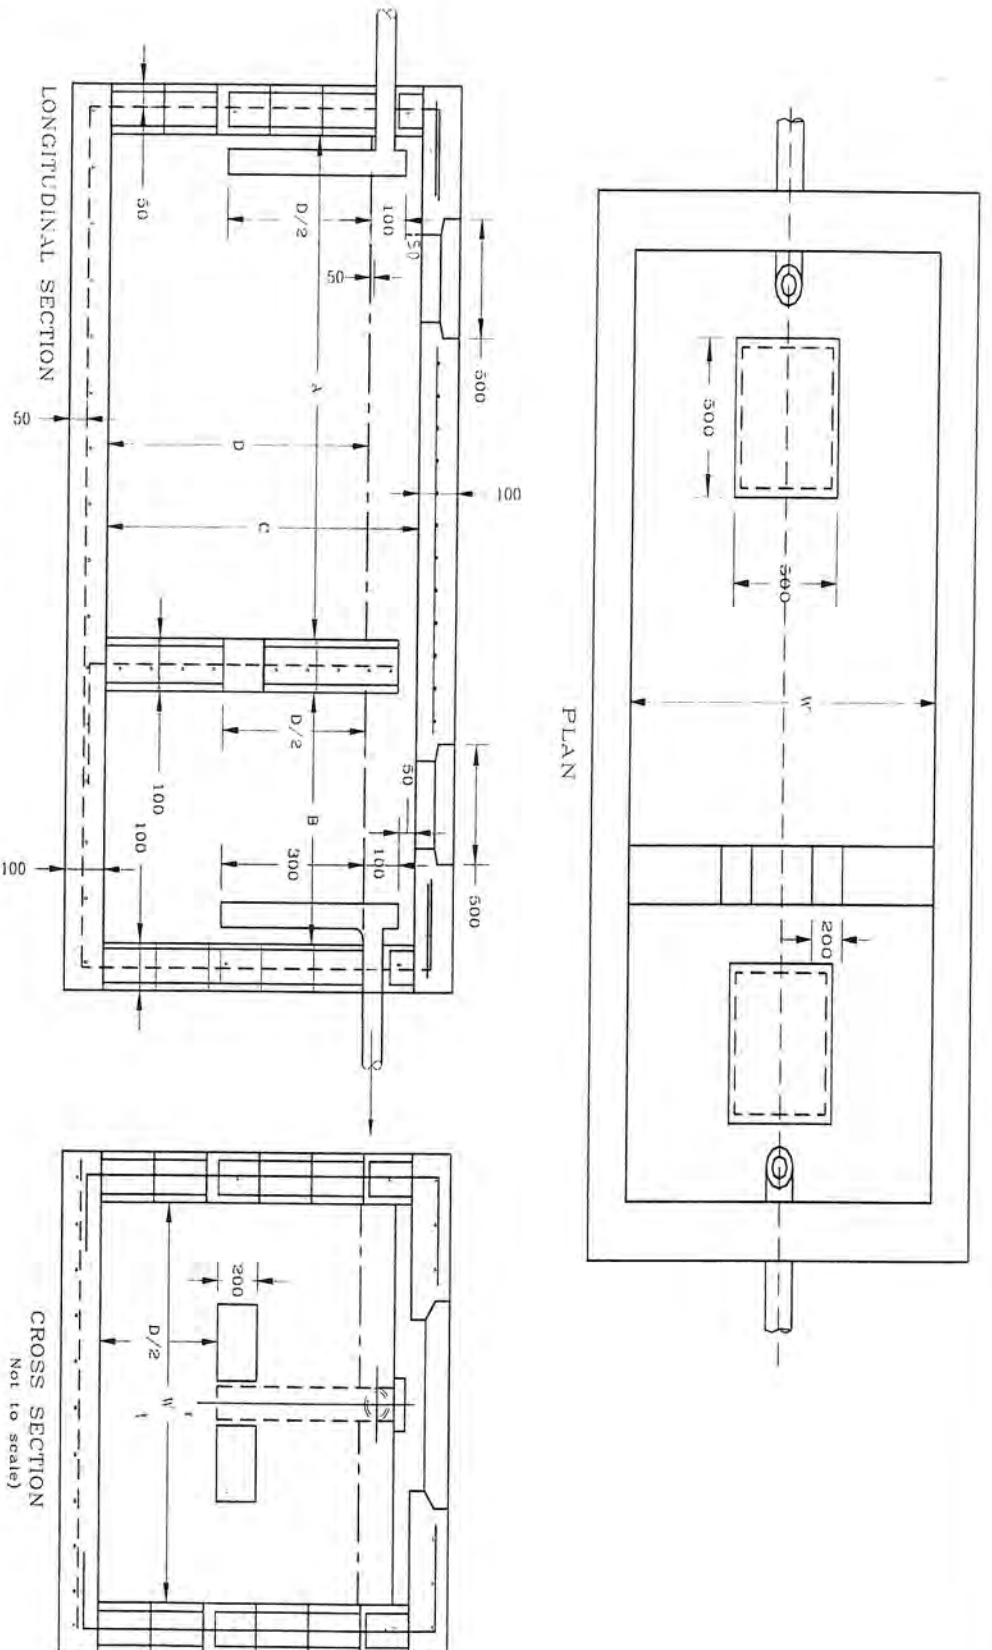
A DETAILS OF REINFORCED CONCRETE SEPTIC TANK
